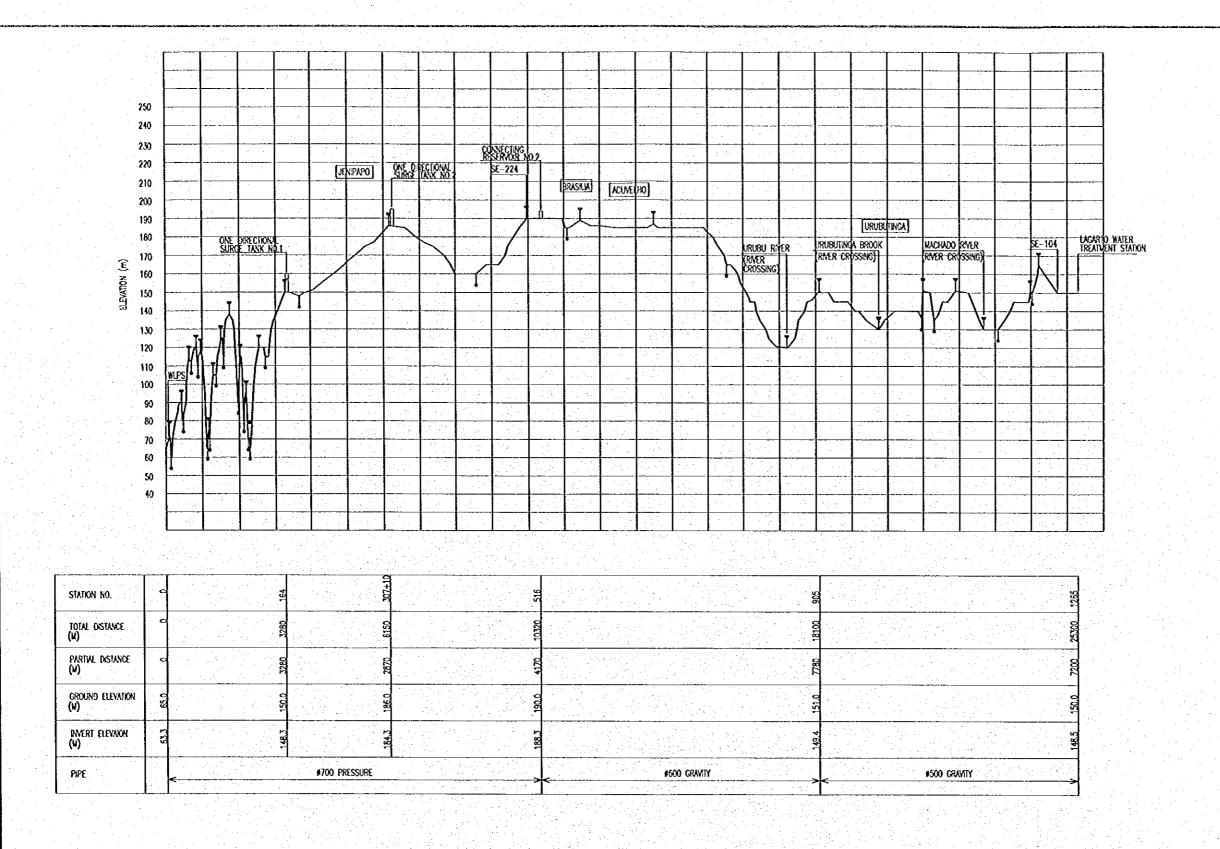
Vertical Profile of Piauitinga Pipeline
